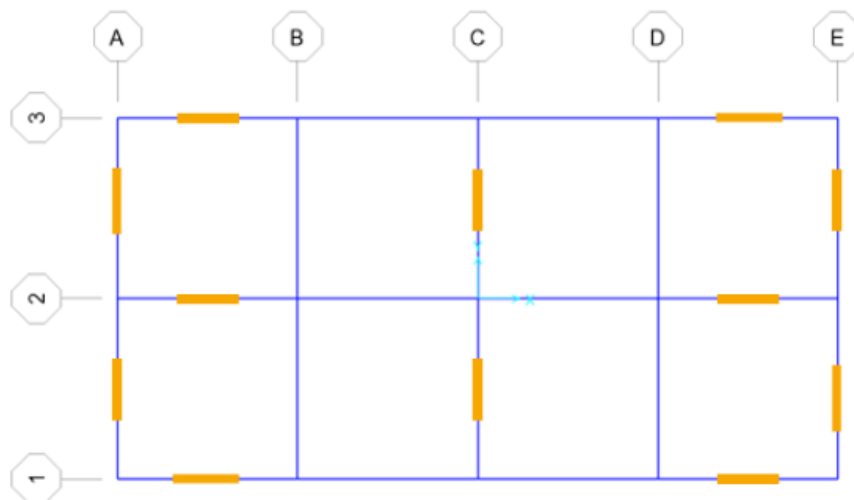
Positioning of light frame timber shear walls (yellow segments) in plan view, for the Italian case.
